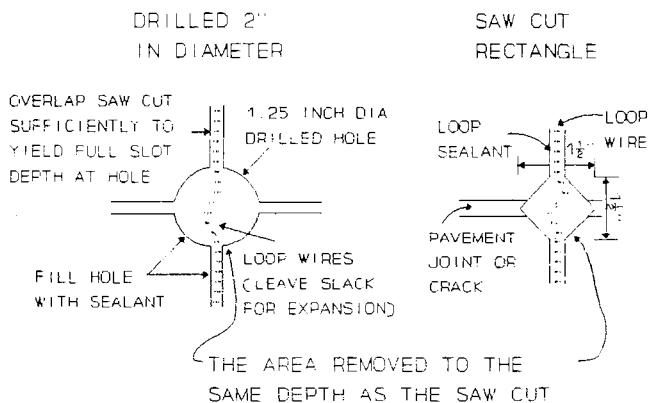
Recommended Treatment at Pavement Cracks and Joints When Crossing is Required
